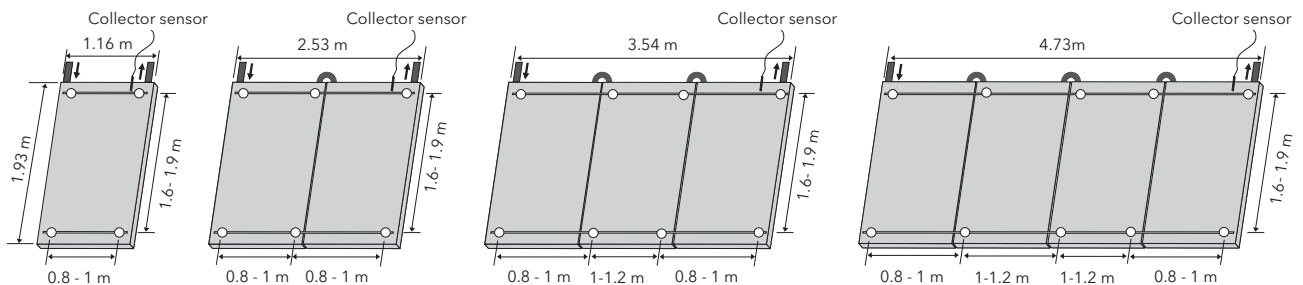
Vertical collector arrangement: Up to 4 EURO C22 in serial connection. The mounting rails run vertically. More than 4 EUROS are combined from serial and parallel connections.
